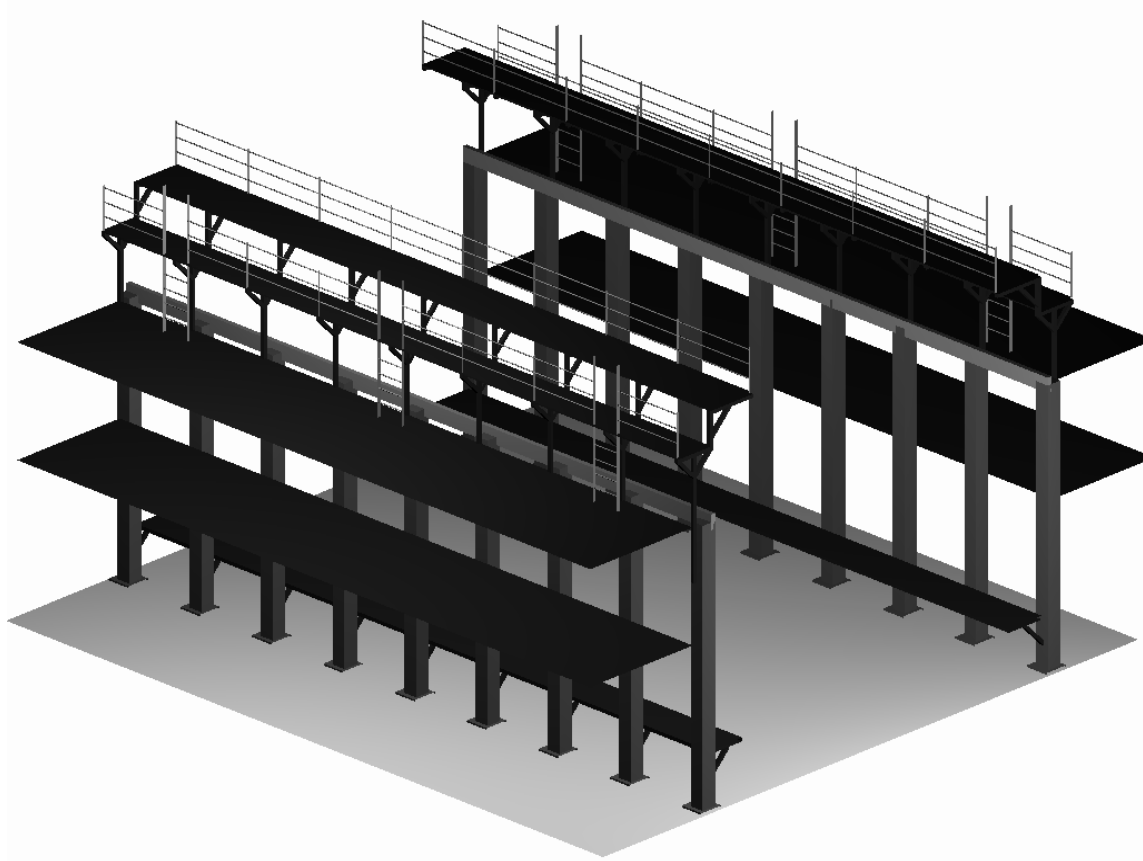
Sketch of the far detector steel support structure. The steel plane support rails are the horizontal members at the top of the vertical columns. The upper electronics platforms and personnel access ladders are located above the rails; the lower electronics platforms are cantilevered from the vertical columns.
